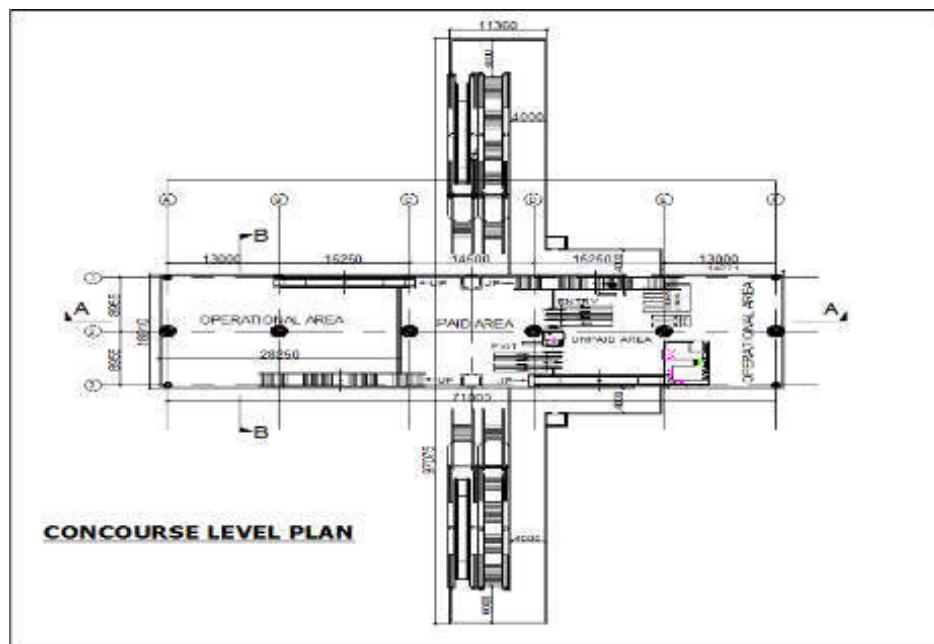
Typical plan of Elevated stations with perpendicular entry / exits
